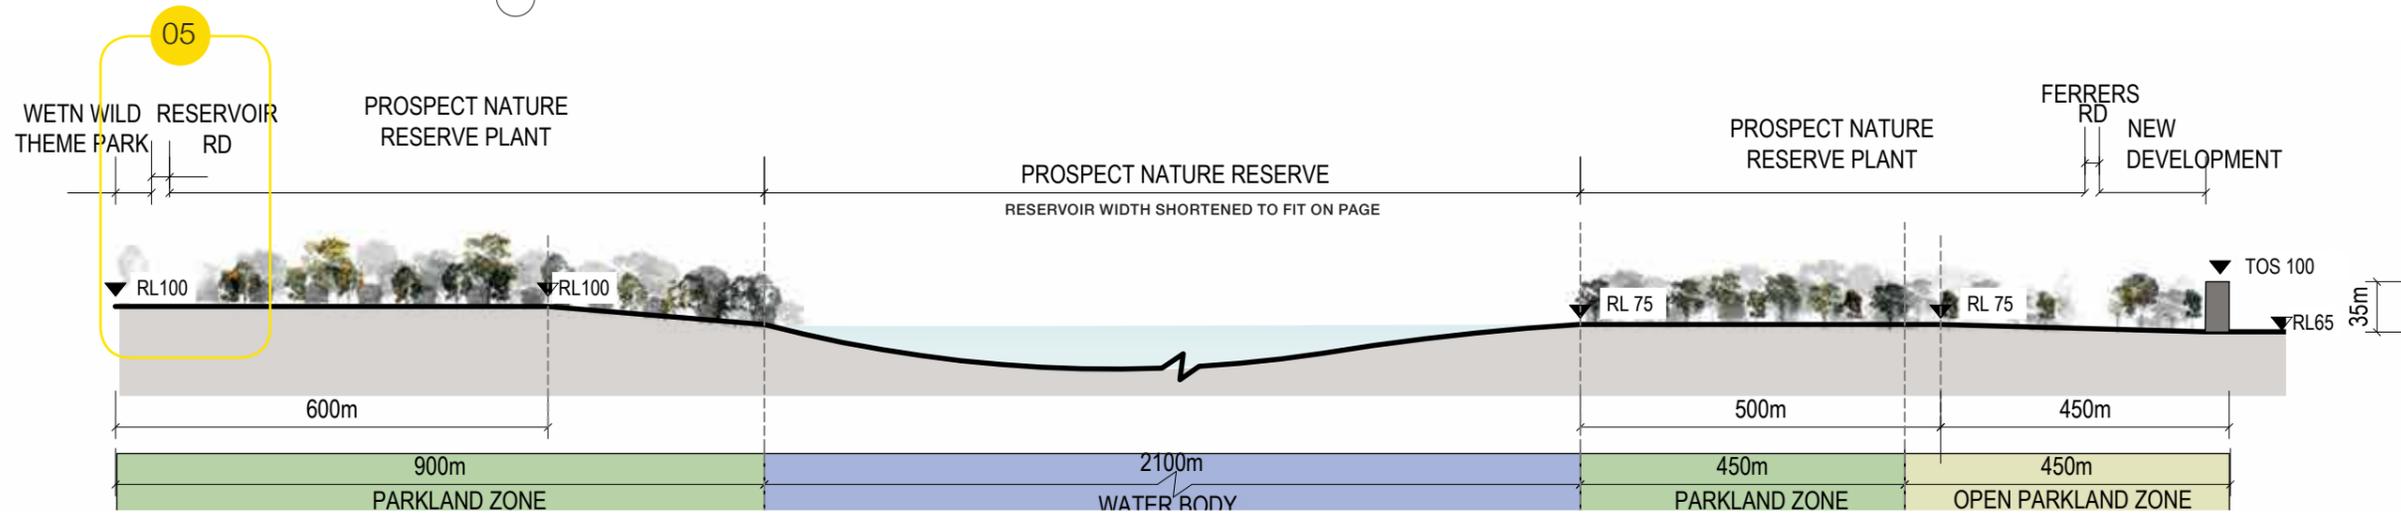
Section 05- Wet n Wild Theme Park to the site
